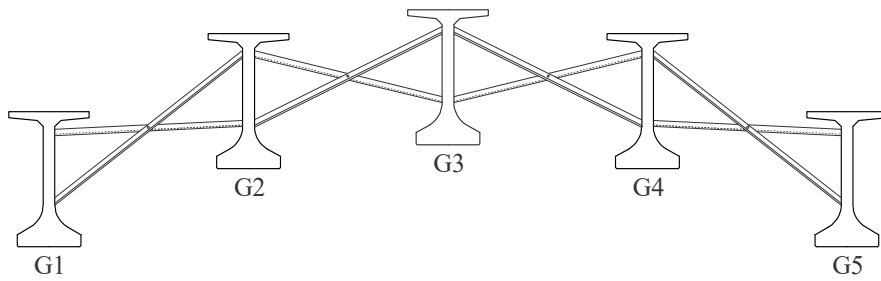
Bridge cross-section midspan deflection with interior steel X-bracing
